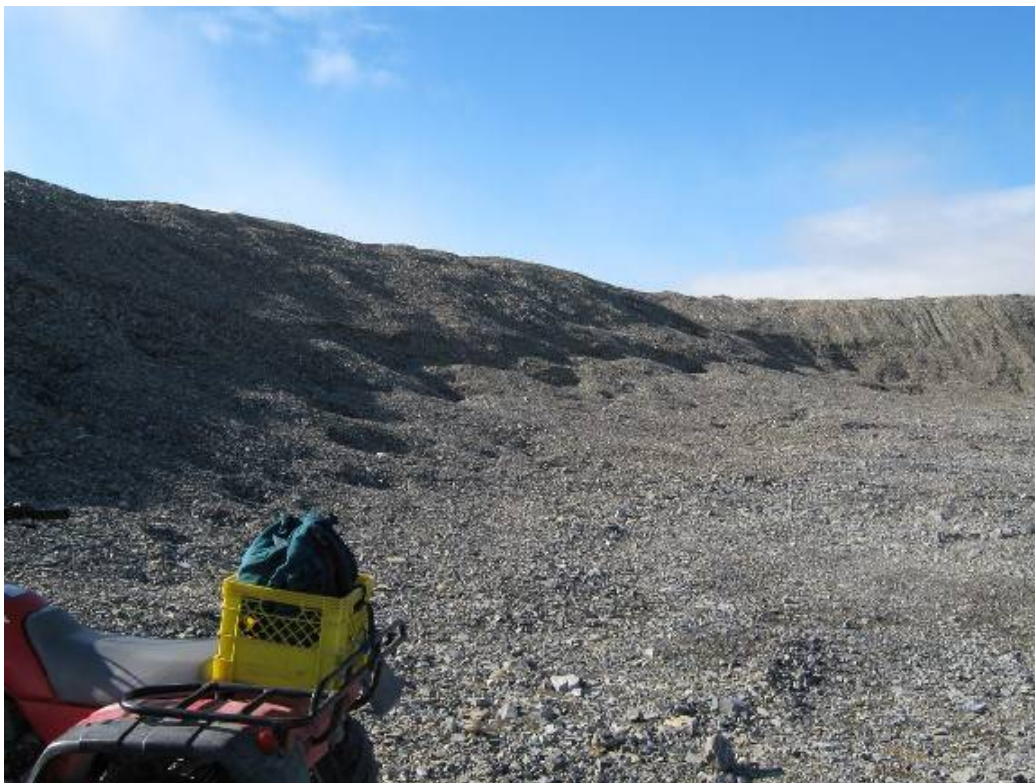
Northing 558950 Easting 8369335 Elevation 15 m
